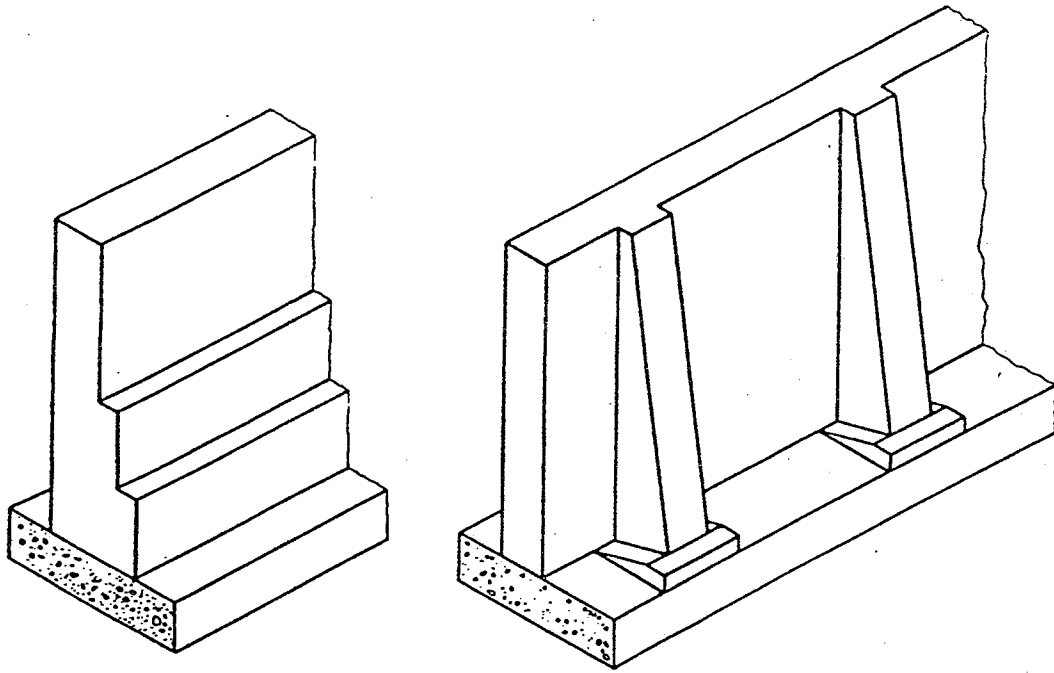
Stepped and Buttressed Retaining Walls in Reinforced Masonry
